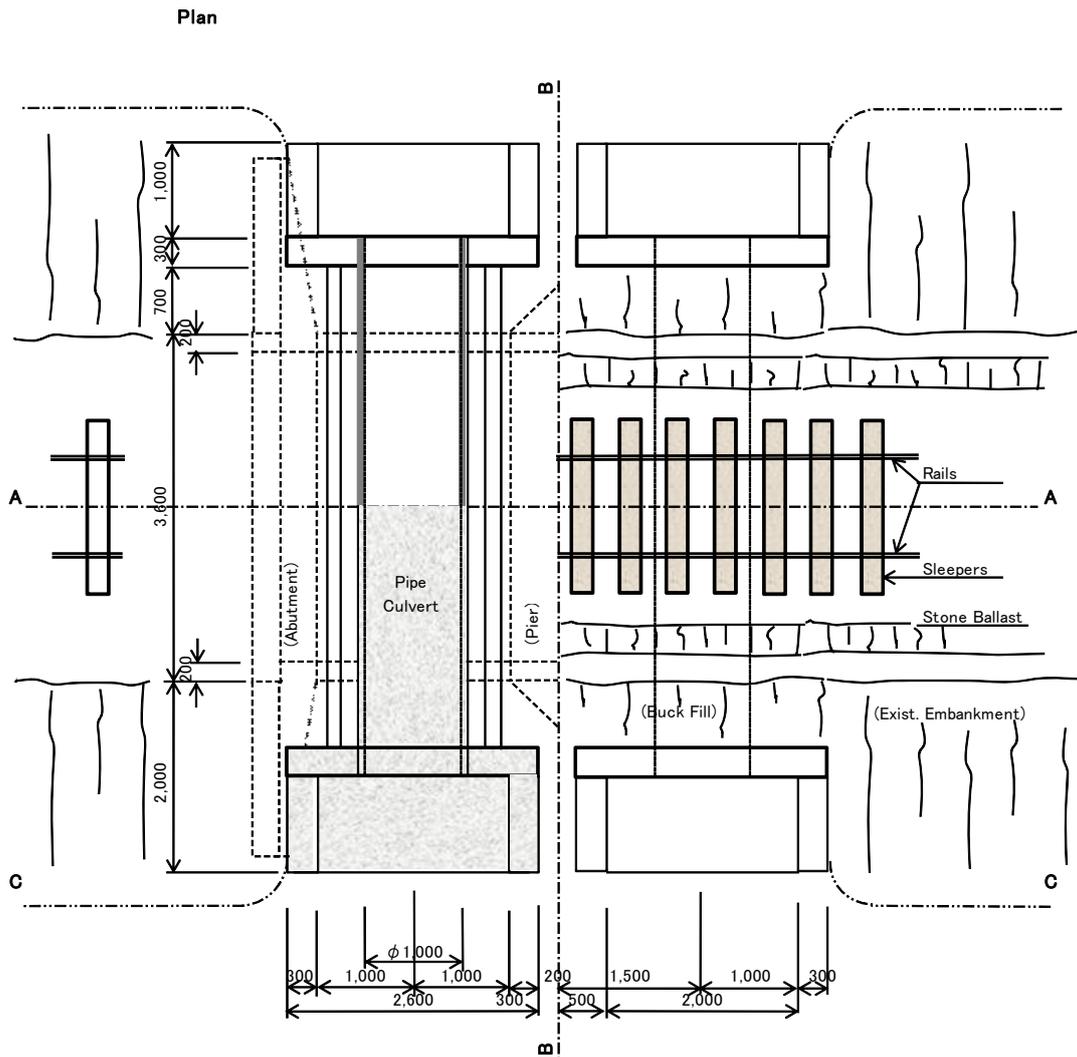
Pipe Culvert (Reconstruction Plan, 2/2)
